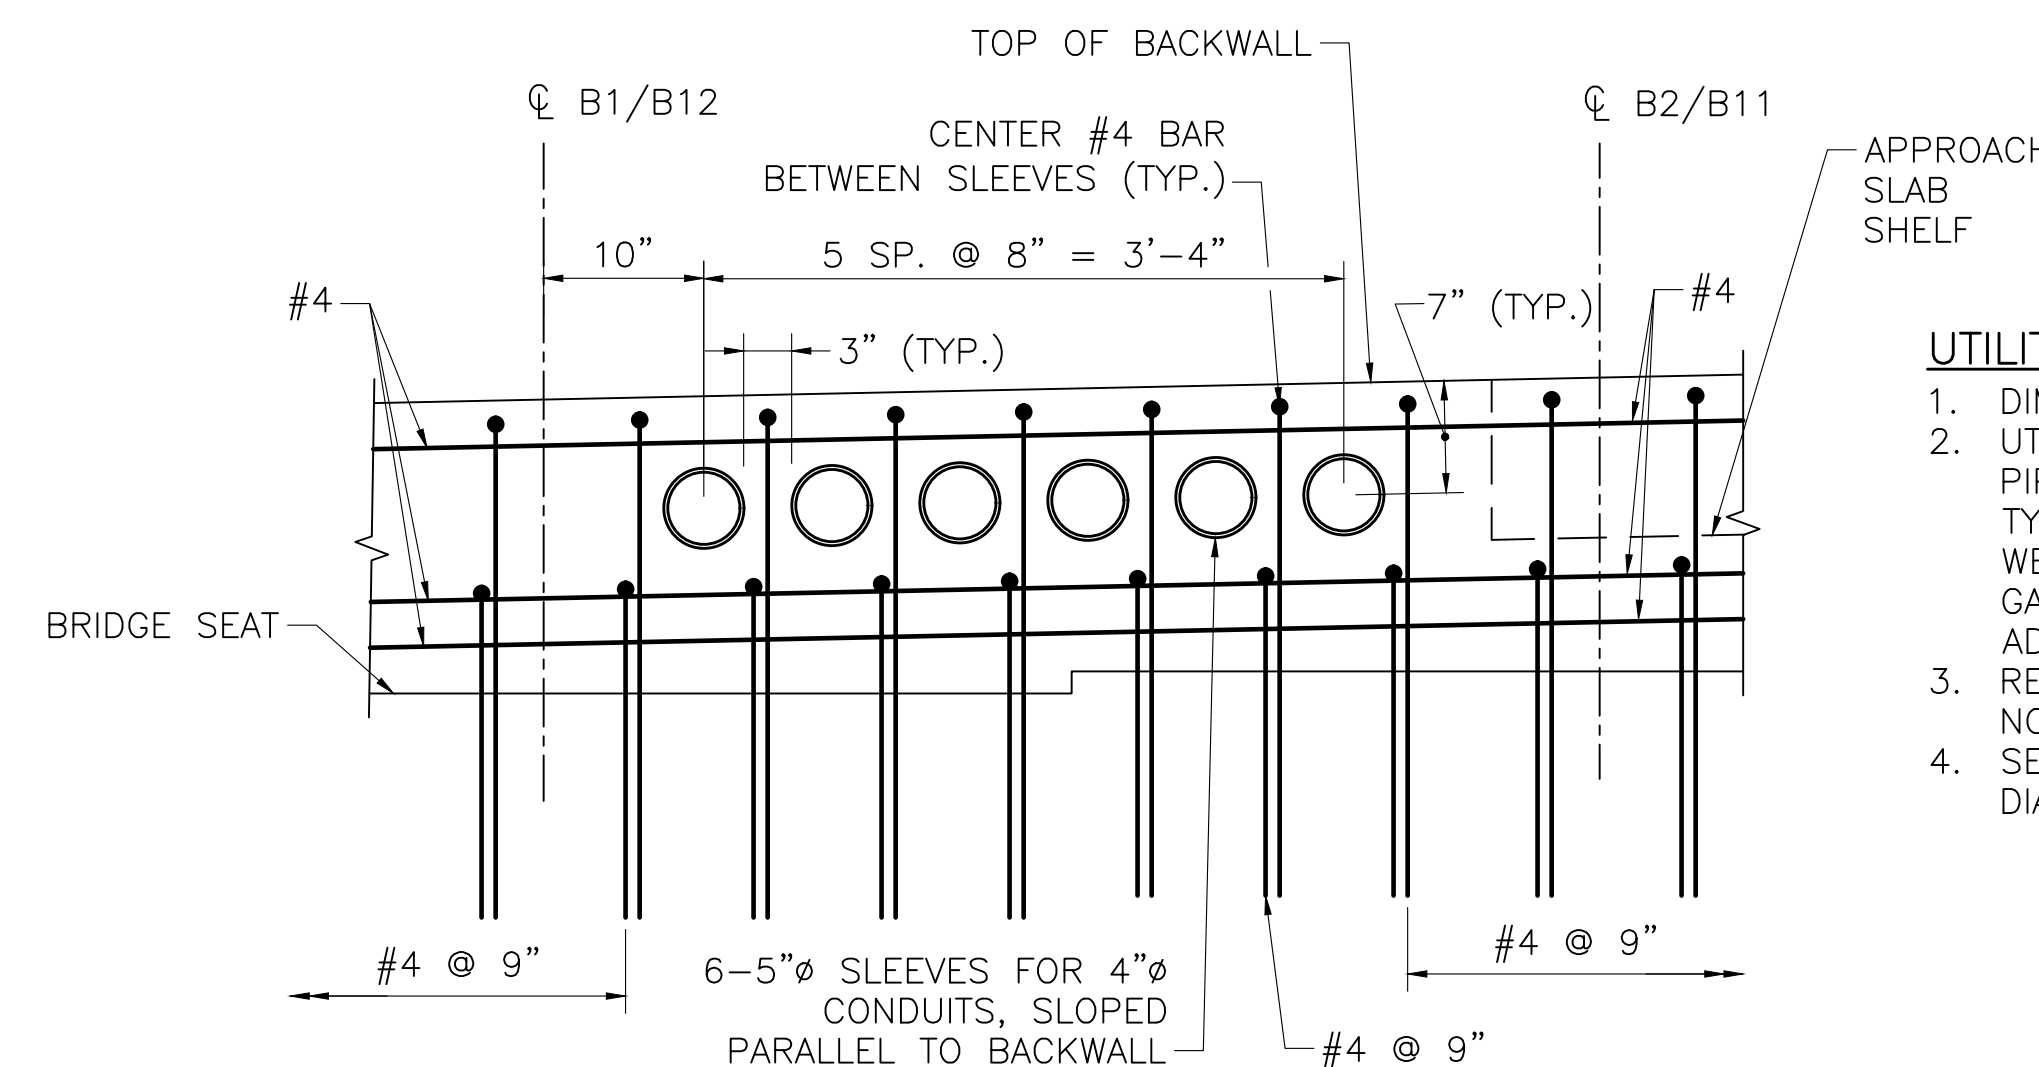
DETAILS AT ABUTMENT - ROADWAY SECTION (WITHIN PBU)
